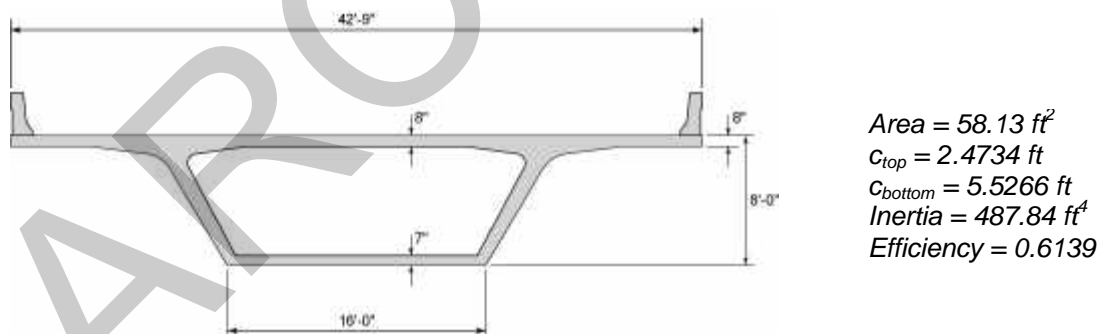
Mid-Bay Bridge Cross-Section Properties
